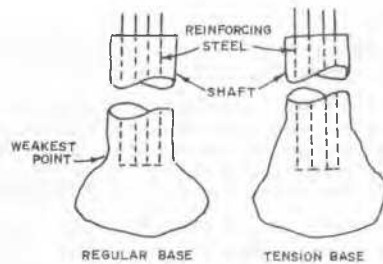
COMPACTED EXPANDED BASE CONCRETE PILES
